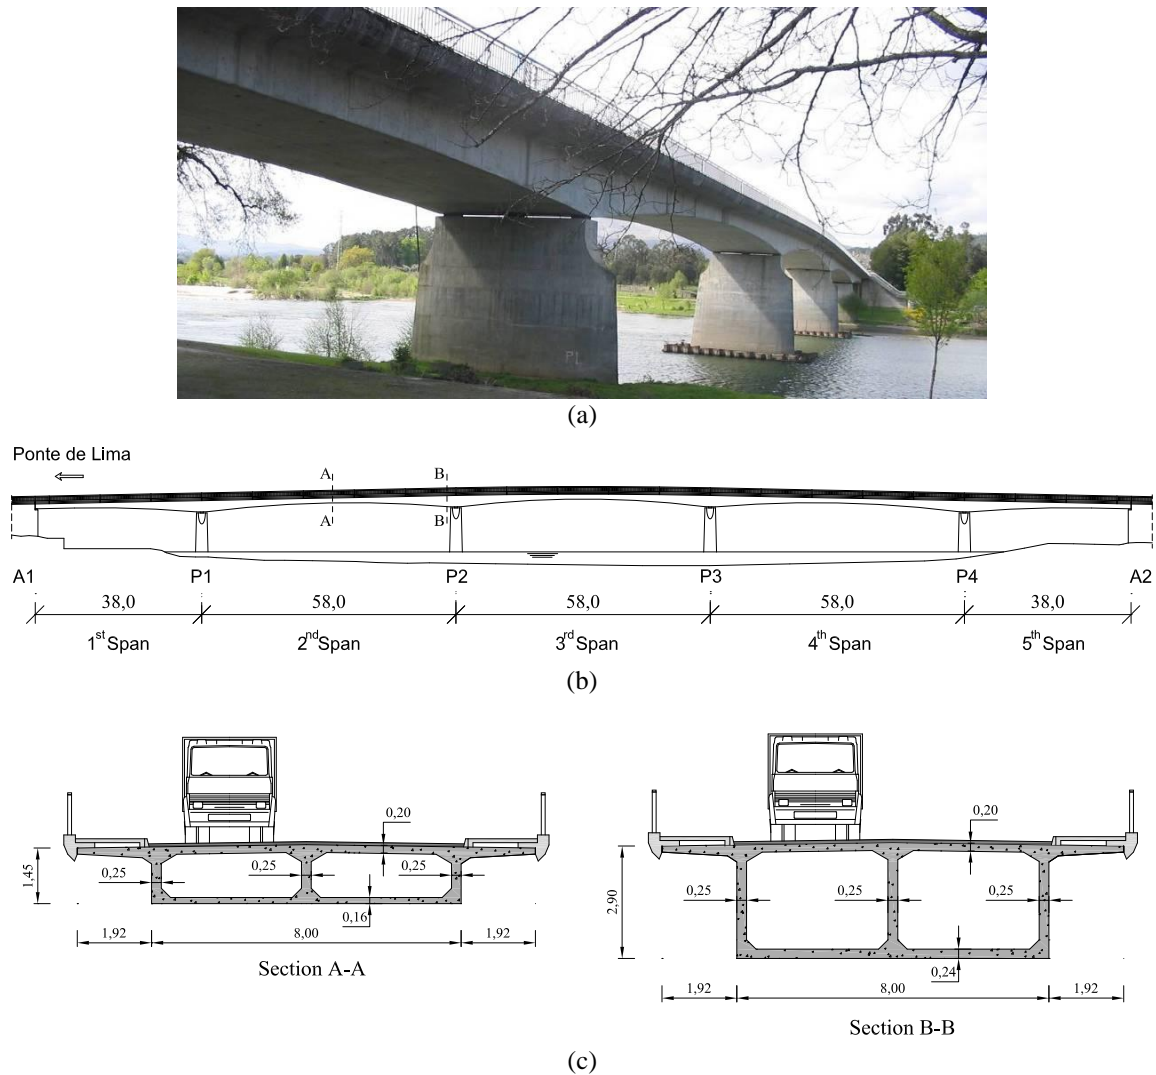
N. S. da Guia Bridge: (a) view of the bridge; (b) side elevation and notation; (c) typical cross-sections.
